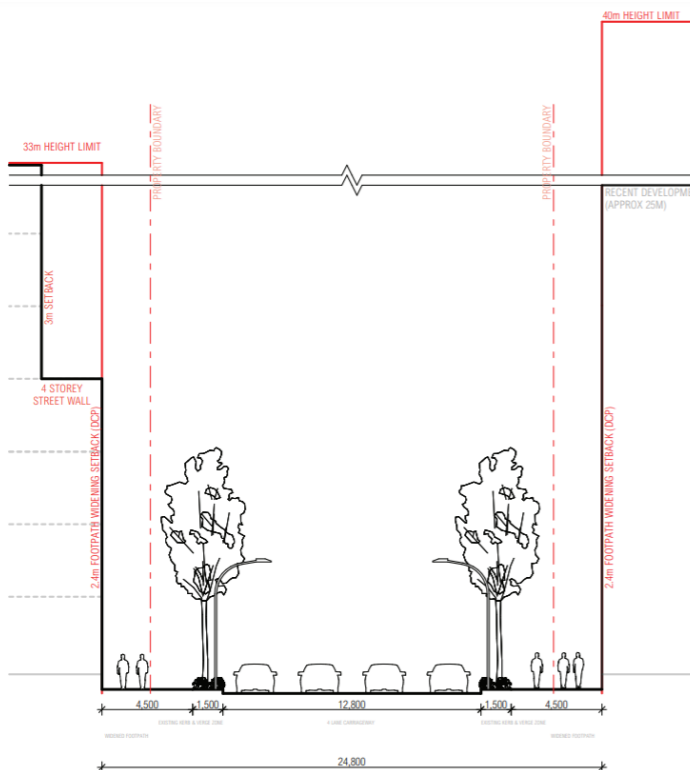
Indicative street section – O’Riordan Street (C), North Alexandria
